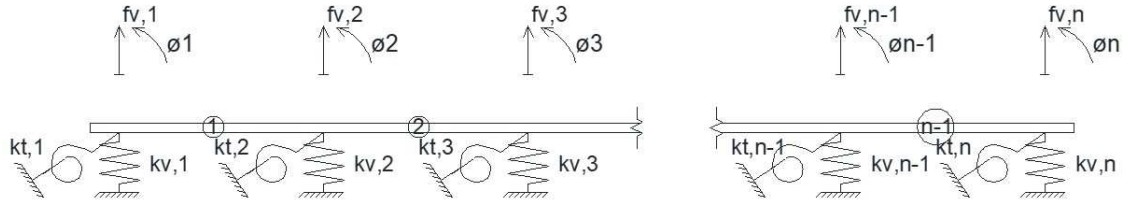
Structural model of a pergola viaduct with 'n' main girders.
